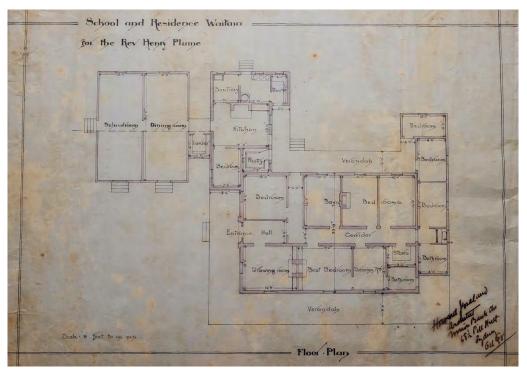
Floor plan for 'School and Residence Waitara, for the Rev Henry Plume', signed by Howard Joseland, architect, October 1895. (Source: Barker College Archives, Plan M0001).
